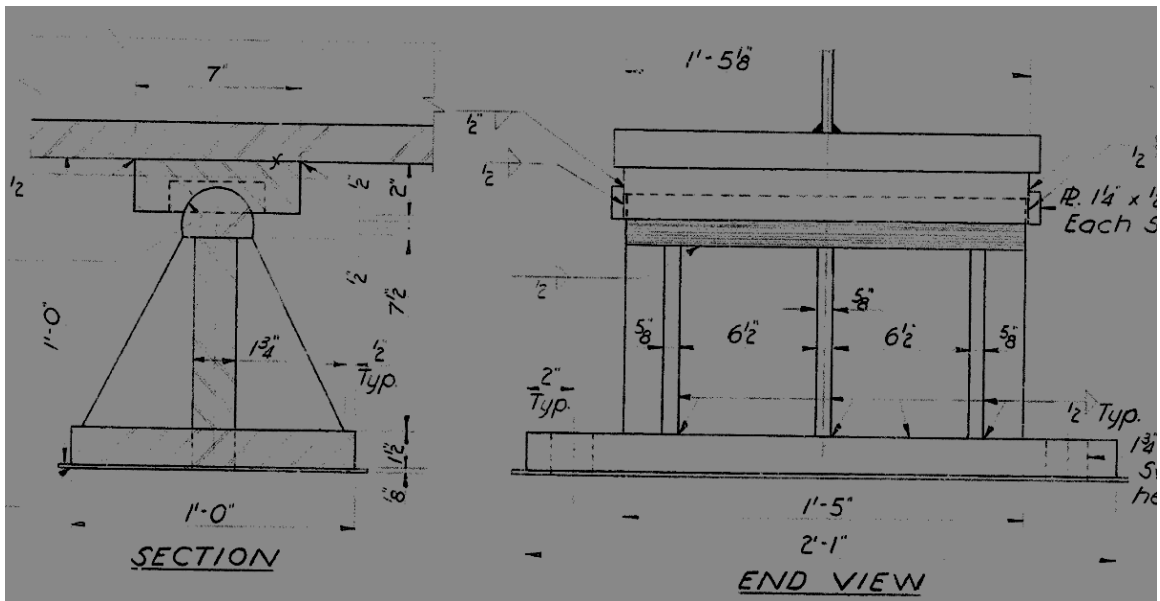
Steel shoe (fixed) bearing details for bearings atop the central pier (excerpted from structural drawings).
